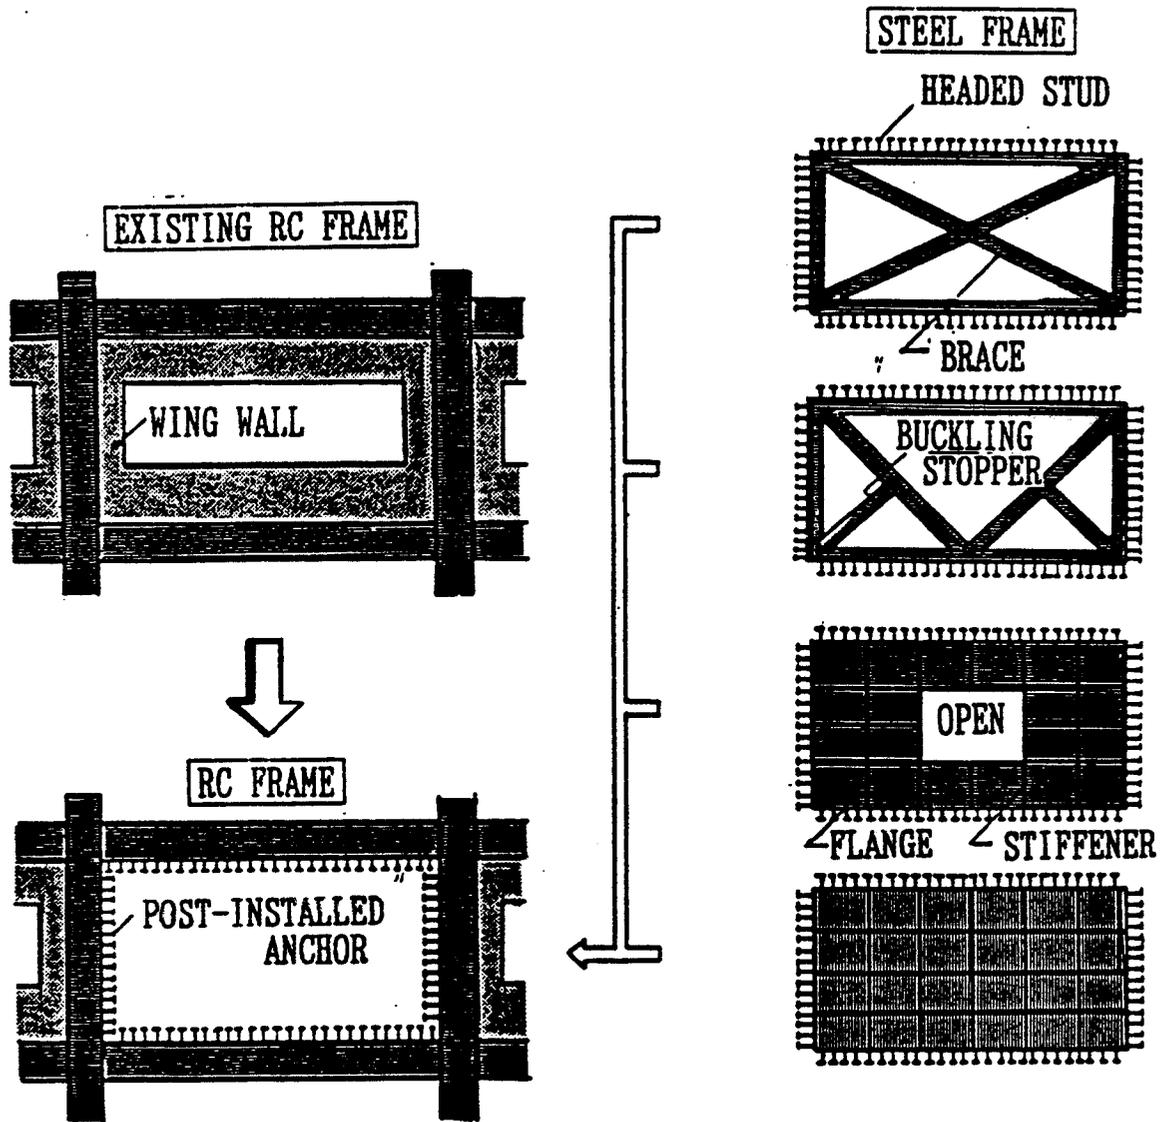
Example of Pre-fabricated Bracing or stiffened Panel attached to RC Frame by Indirect Connection (From Ref. 8).
